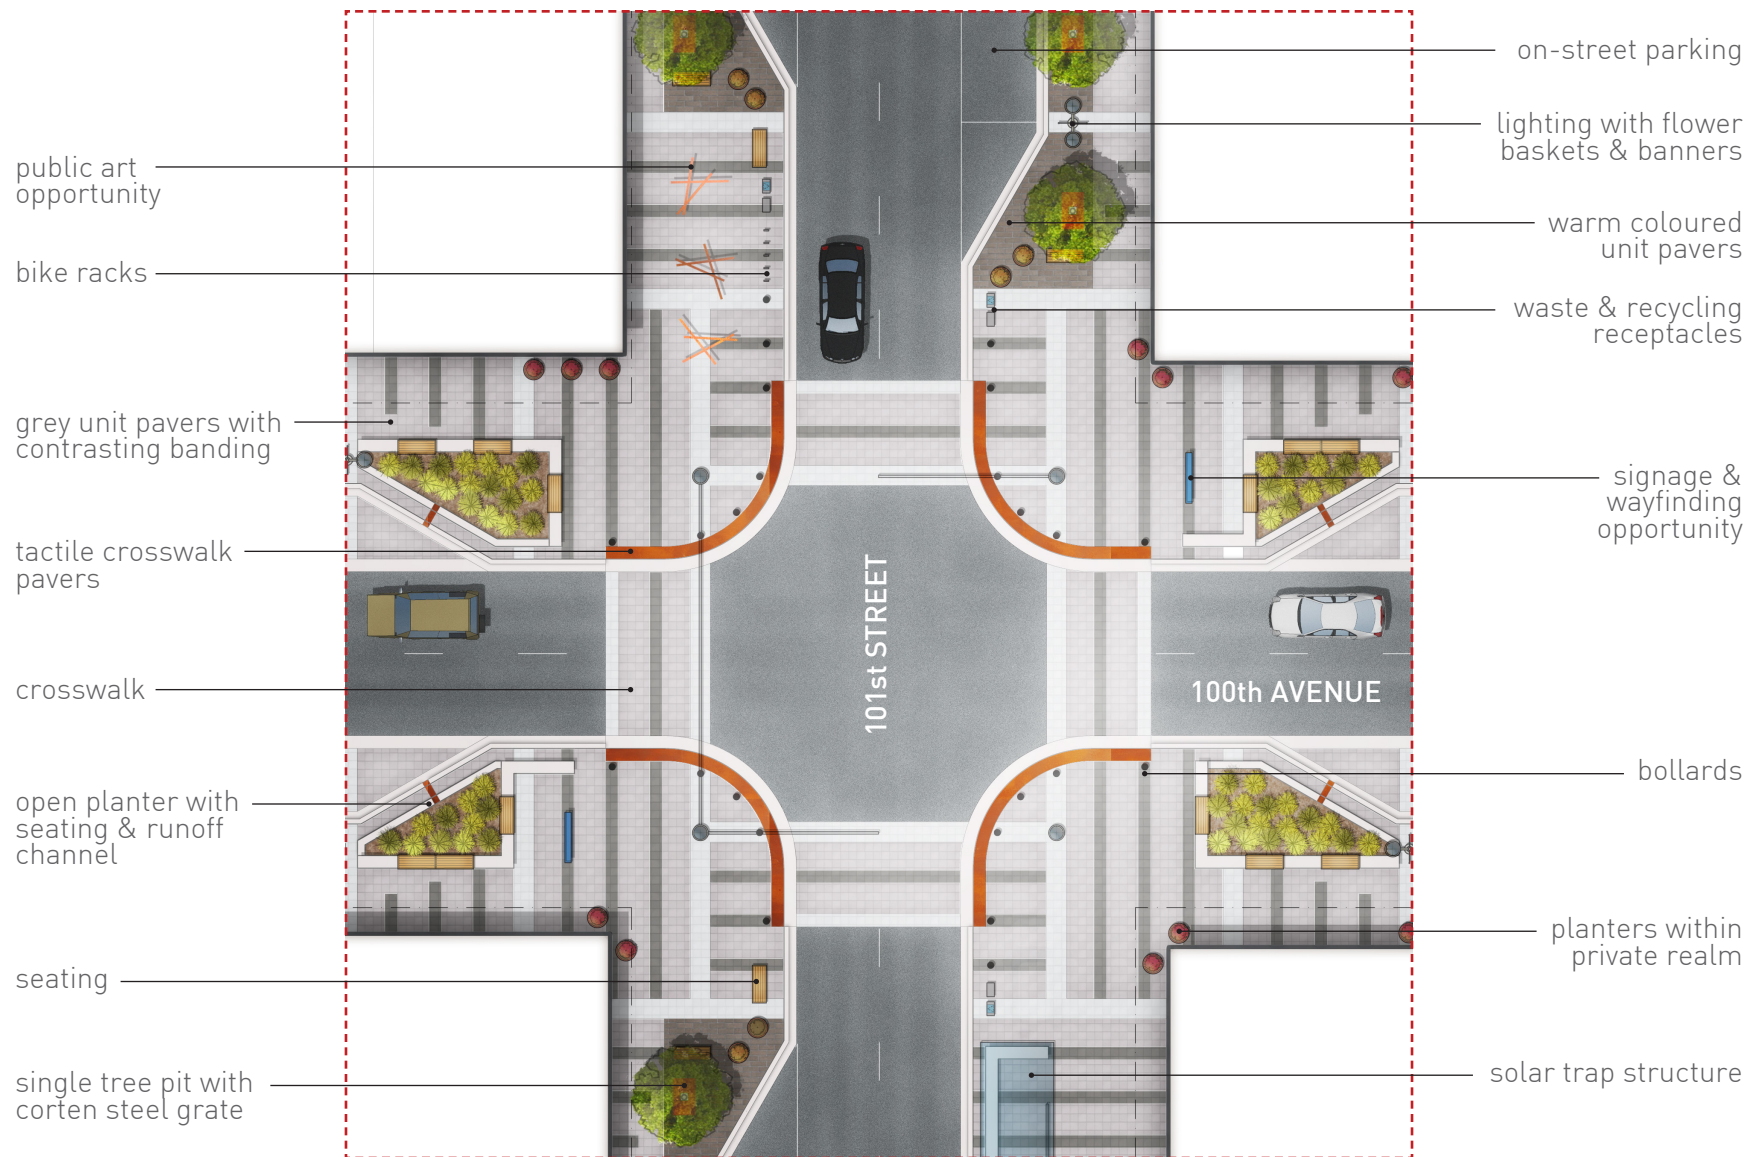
Urban Avenue (100th Avenue) Enhanced Intersection Demonstration Plan
